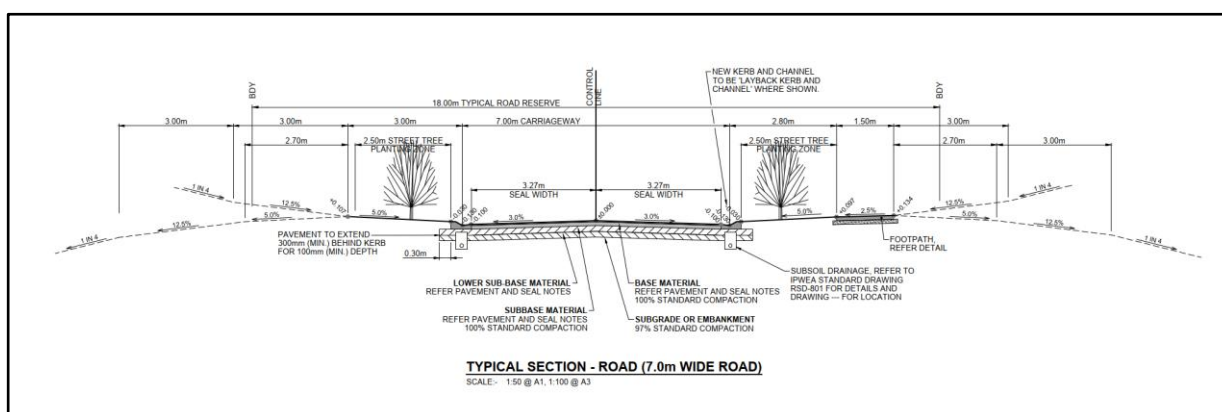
NEW INTERNAL 18.0M ROAD RESERVE TYPICAL CROSS-SECTION
